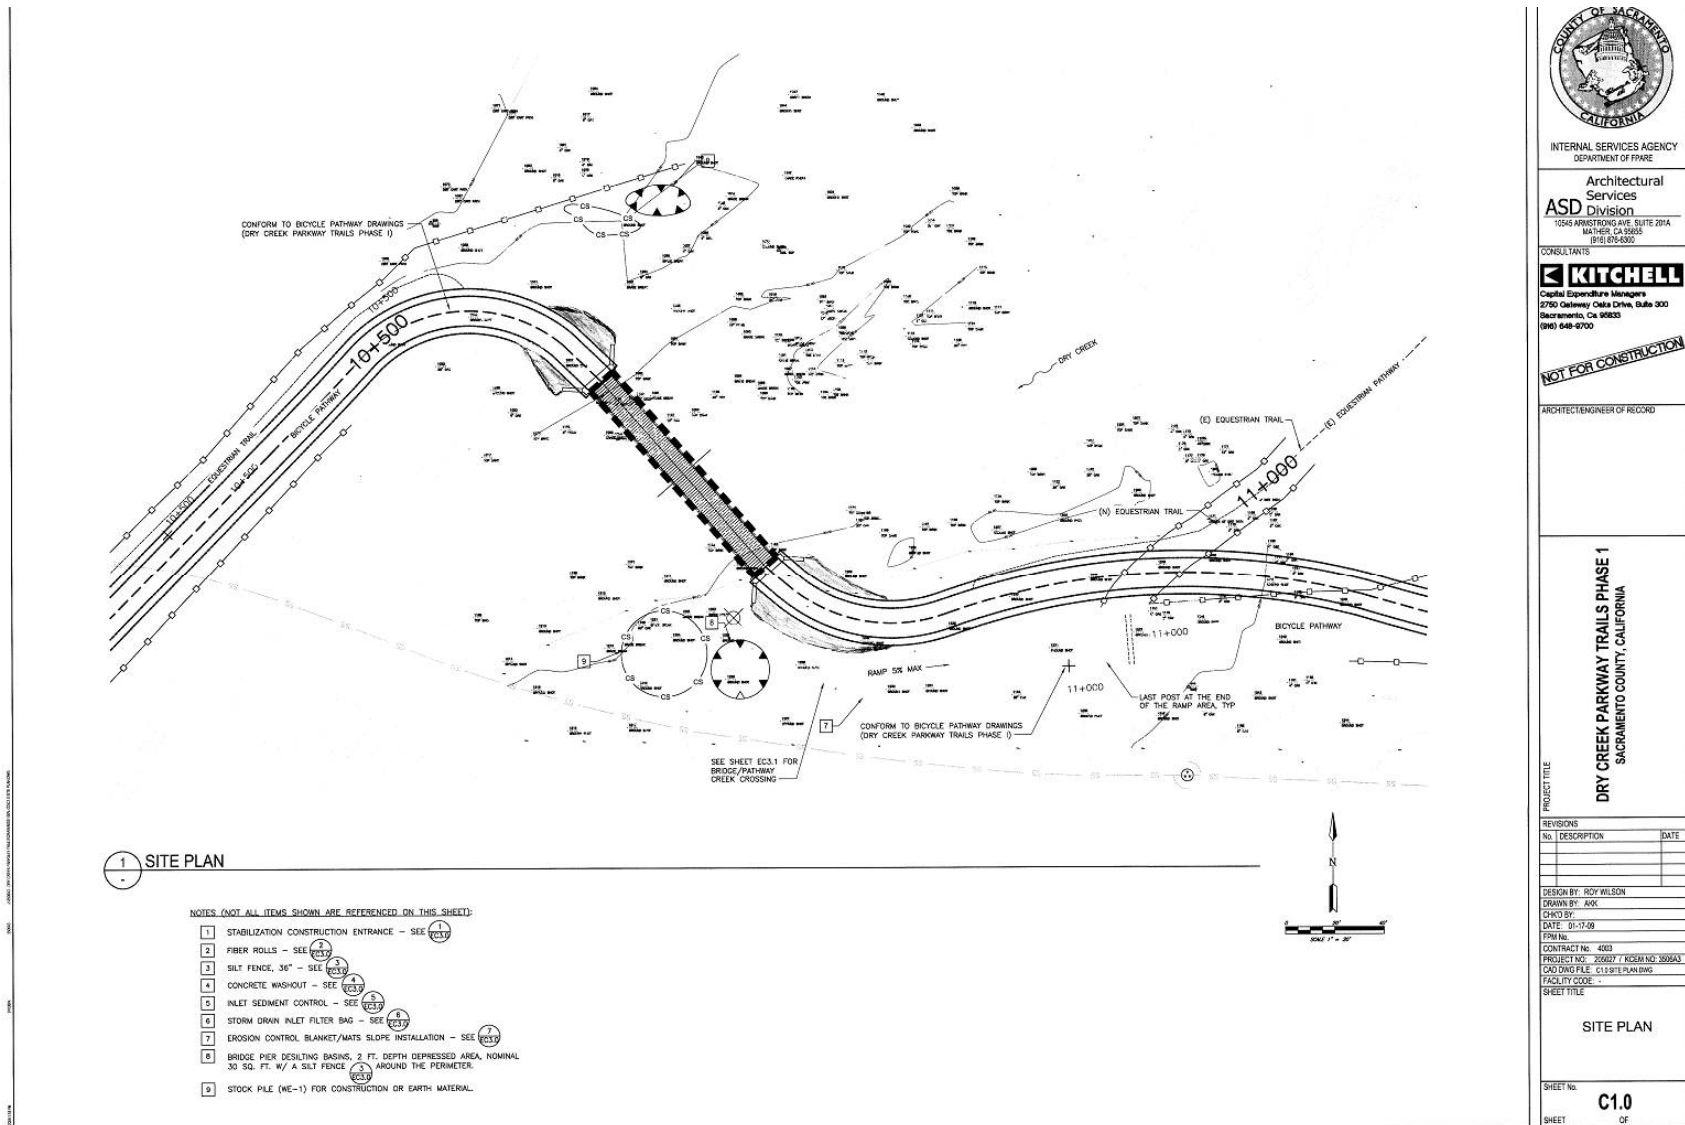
Pedestrian Bridge Site Plan, Alternative 2
